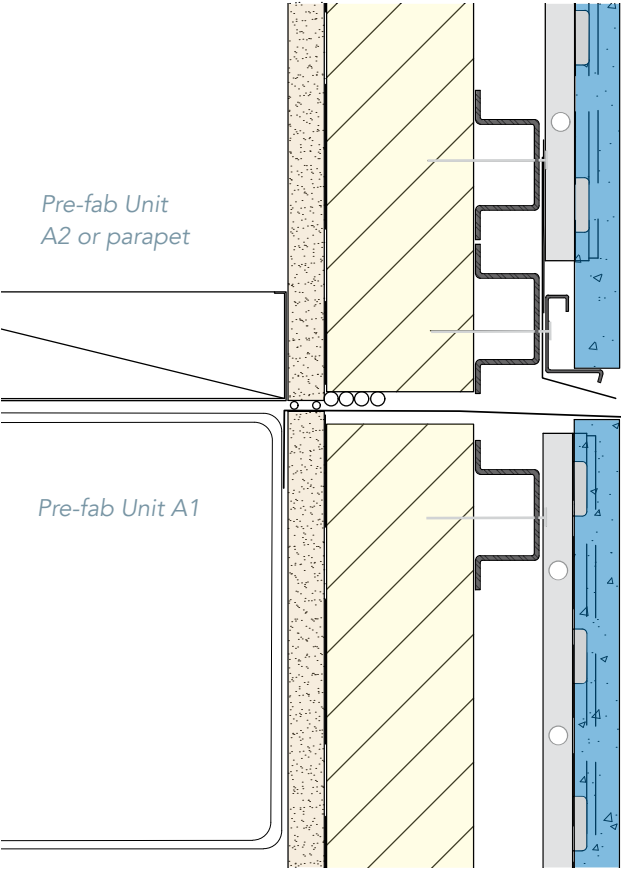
Detail H - (Vertical AWP) Vertical Unit Joint - Complete Offsite Pre-Installation
